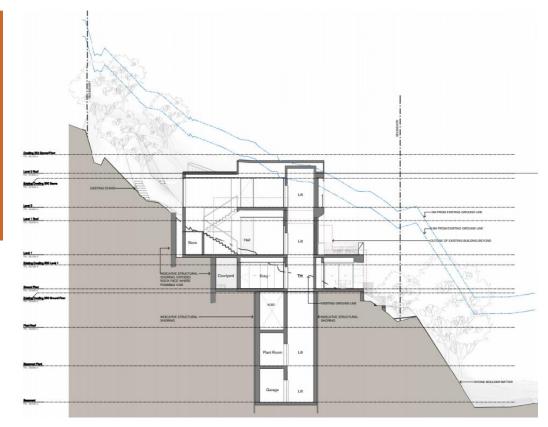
Proposed section 3, looking north, Extract from Sections Sheet 3 (Source: Drawing No. 3002, Rev. A)
